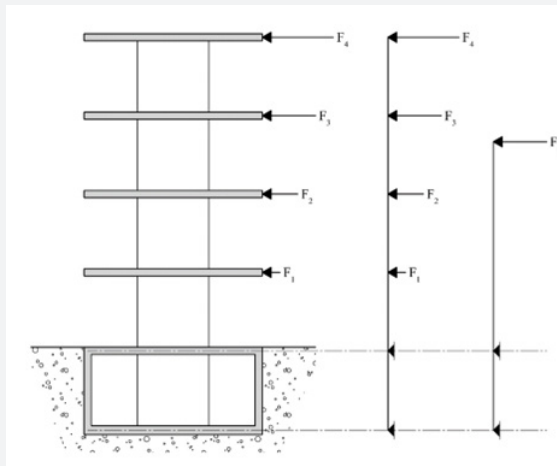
Reinforcement of a multi-store building: a) building model b) statical system c) simplified statical system according to a SDOF.
